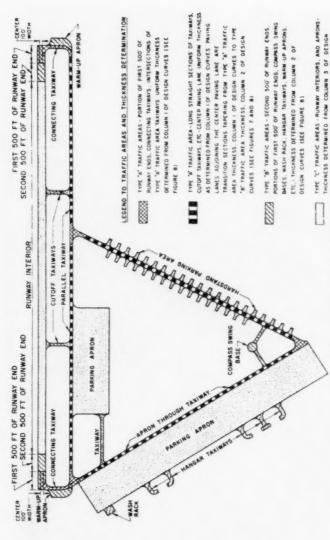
Primary use pavements required to be constructed of Portland Cement Concrete
